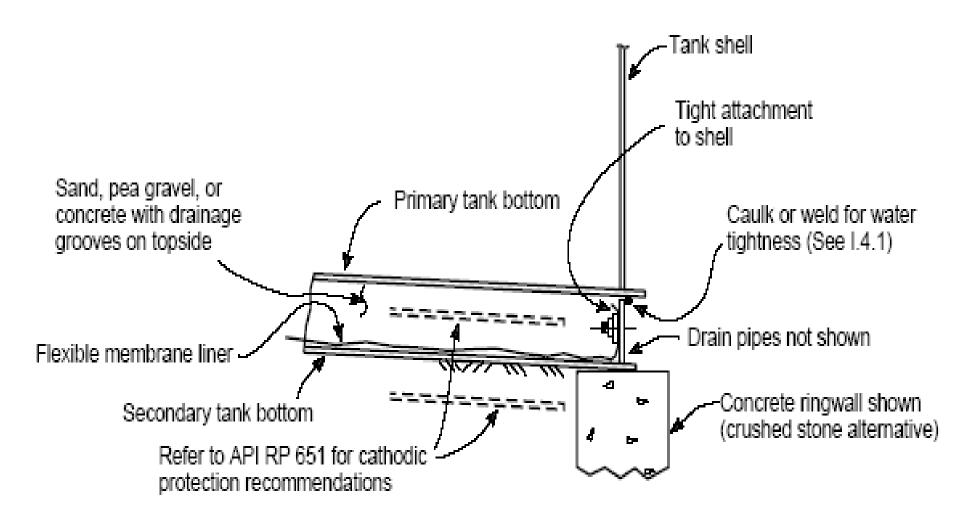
Double Steel Bottom with Leak Detection at the Tank Perimeter (Typical Arrangement)
